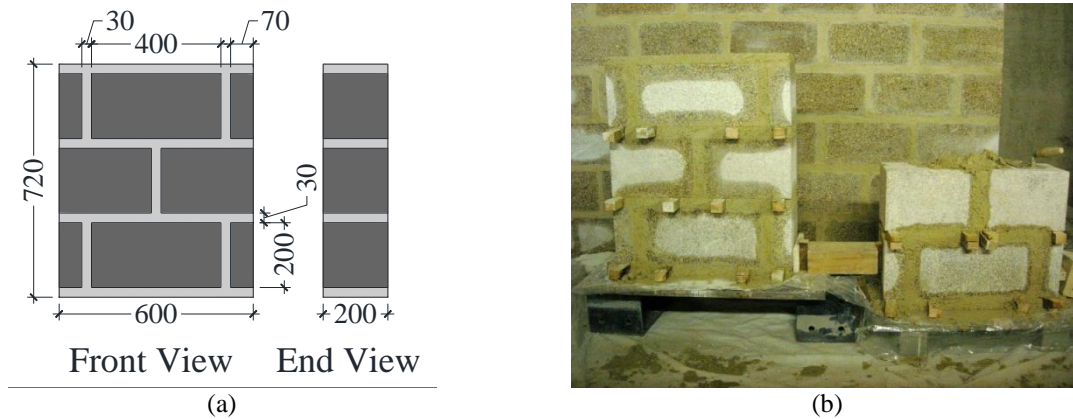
Regular masonry wallets: (a) design (dimensions in mm); and (b) construction
